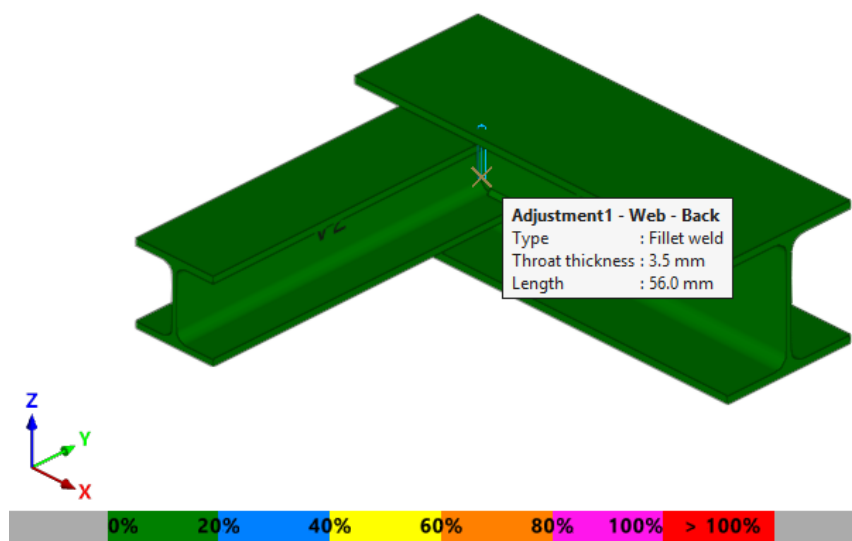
Most critical welding – 15mm plate thickness
